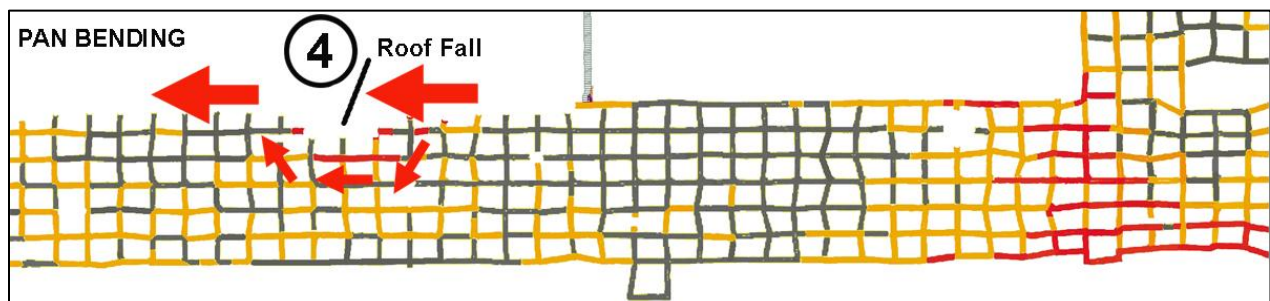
D. #21 Tailgate: GRAY: Roof pans are unbent.. ORANGE: Roof pans bent >90 degrees. RED: Roof pans are severely bent.
